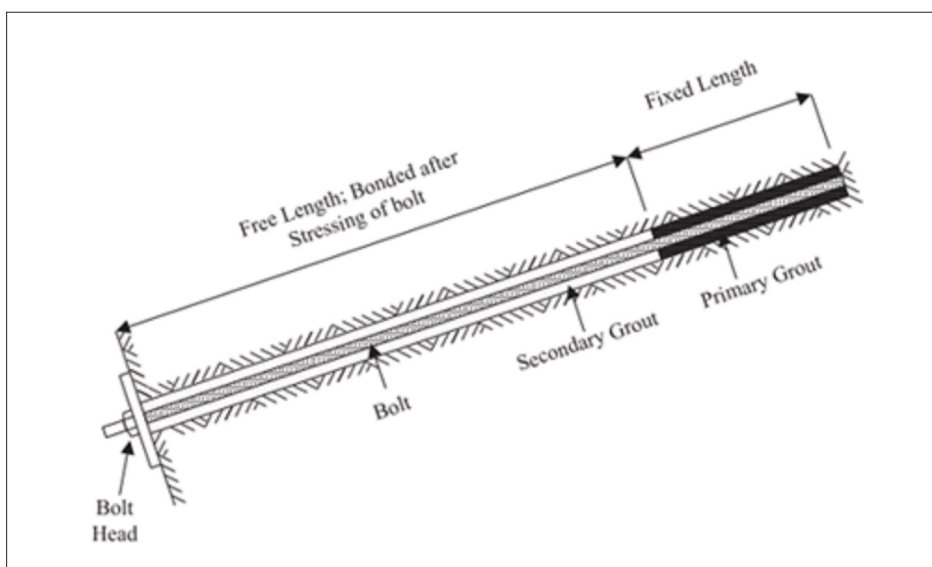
Typical rock bolt detail (Adapted from Geotechnical Engineering Office, Civil Engineering & Development Department, 2011)
